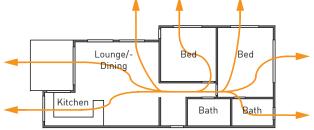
C.4-1: Building layout that facilitates cross ventilation.
